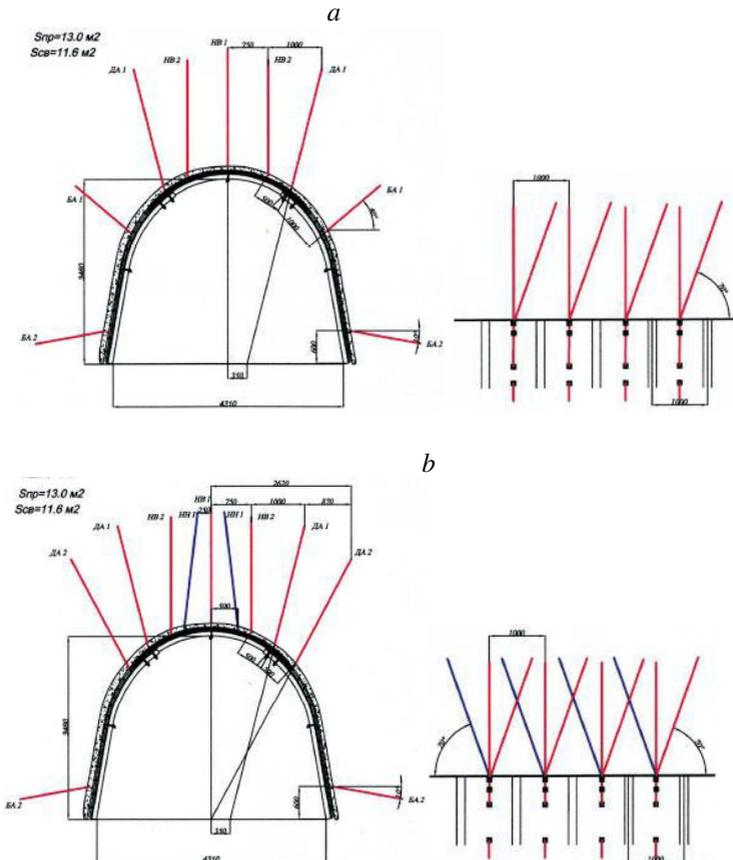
Combined frame-bolt support with reinforced roof bolting in the roadway 585 of the Yubileynaya Mine: *a* - Simple sector; *b* - sector "bridge"
